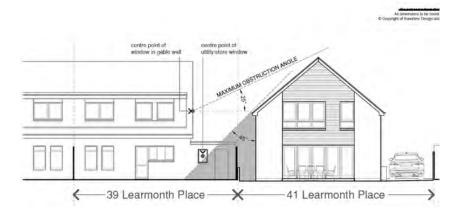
Original Planning Application – Elevation from the Ground – Daylight and Sunlight
